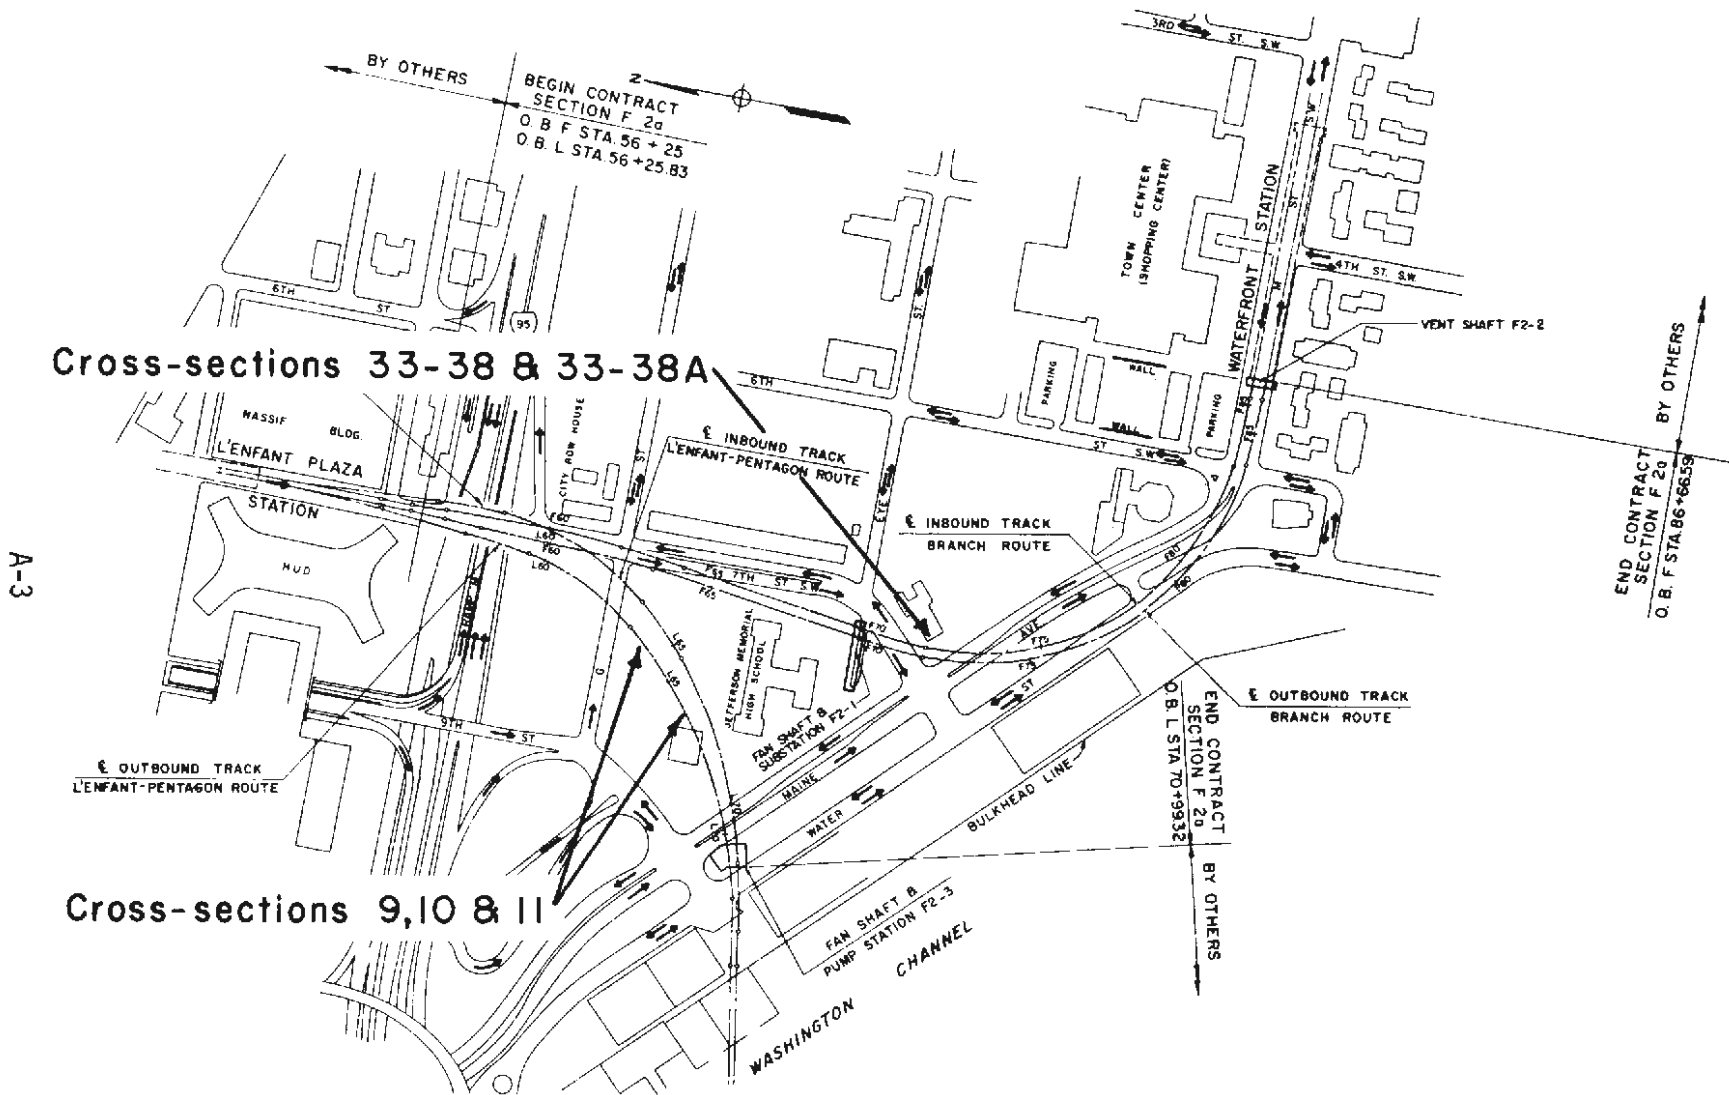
LOCATION MAP OF WASHINGTON, D.C. METRO SYSTEM EARTH TUNNELS
